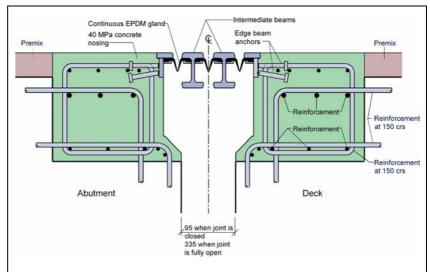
Typical section through a HONEL GAM 240 Series Multi-Element bridge deck expansion joint showing edge and intermediate beams and elastomeric glands
